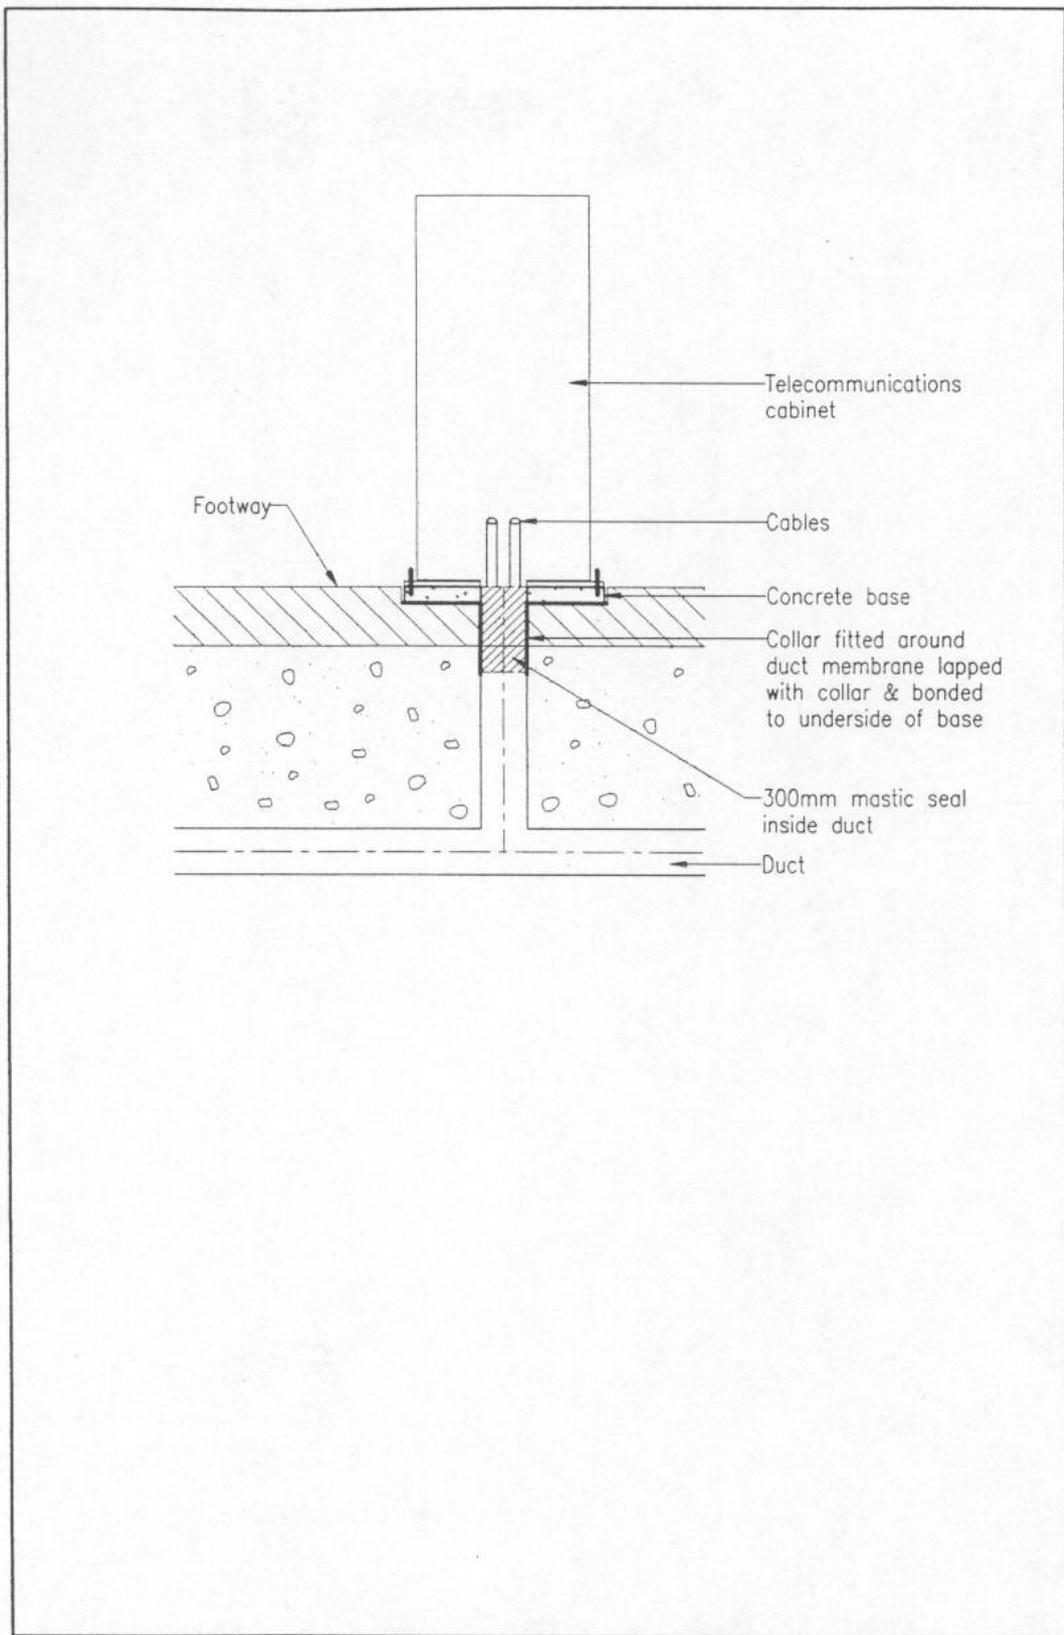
TYPICAL SURFACE DETAIL FOR ABOVE GROUND TERMINATION OF SERVICES WITHIN THE CONSULTATION ZONE (CROSS-SECTION)
